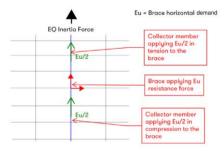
Plan view example of suspended ceiling load accumulation adjacent to back brace
